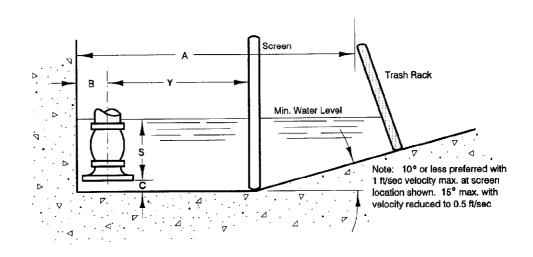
Sump dimensions, elevation view, wet pit type pumps
